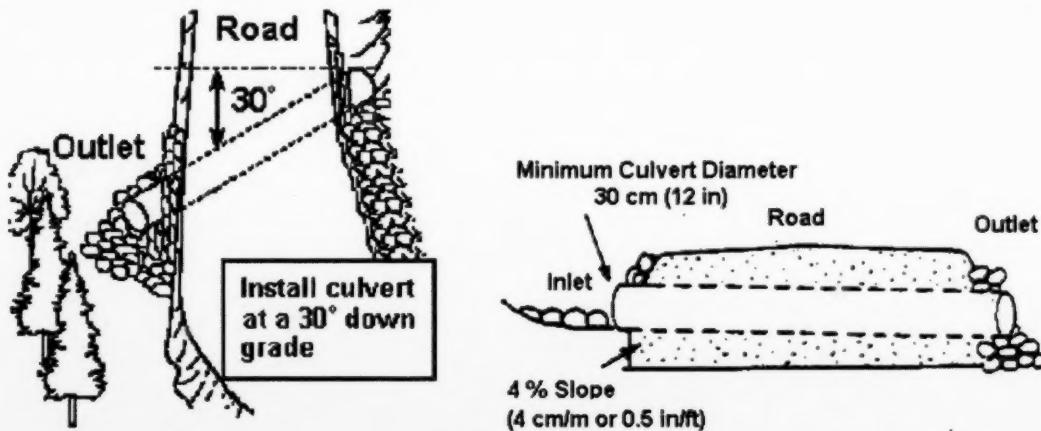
Installation of a cross-drainage and slope from inlet to outlet
